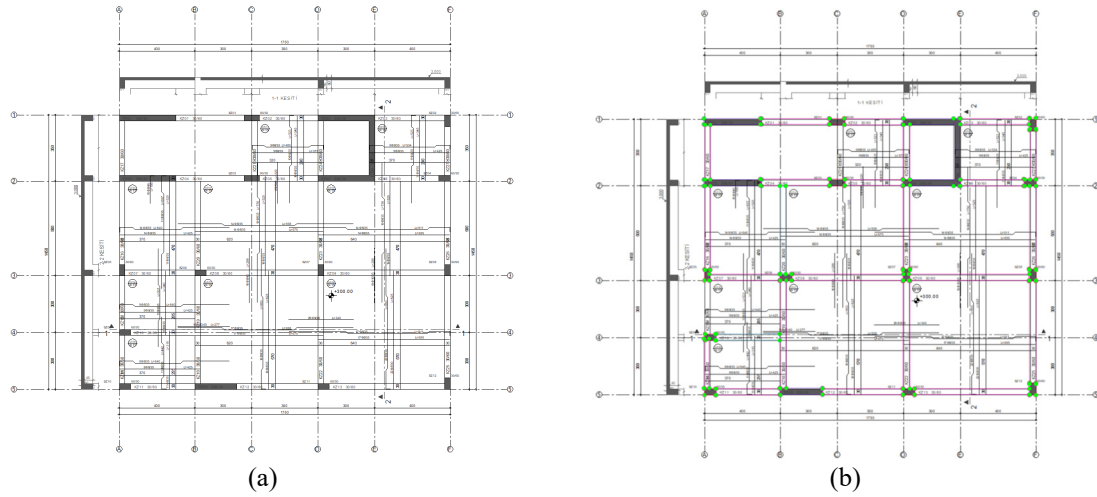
Labeling of a floor plan (a) original plan; (b) labeled load bearing elements
